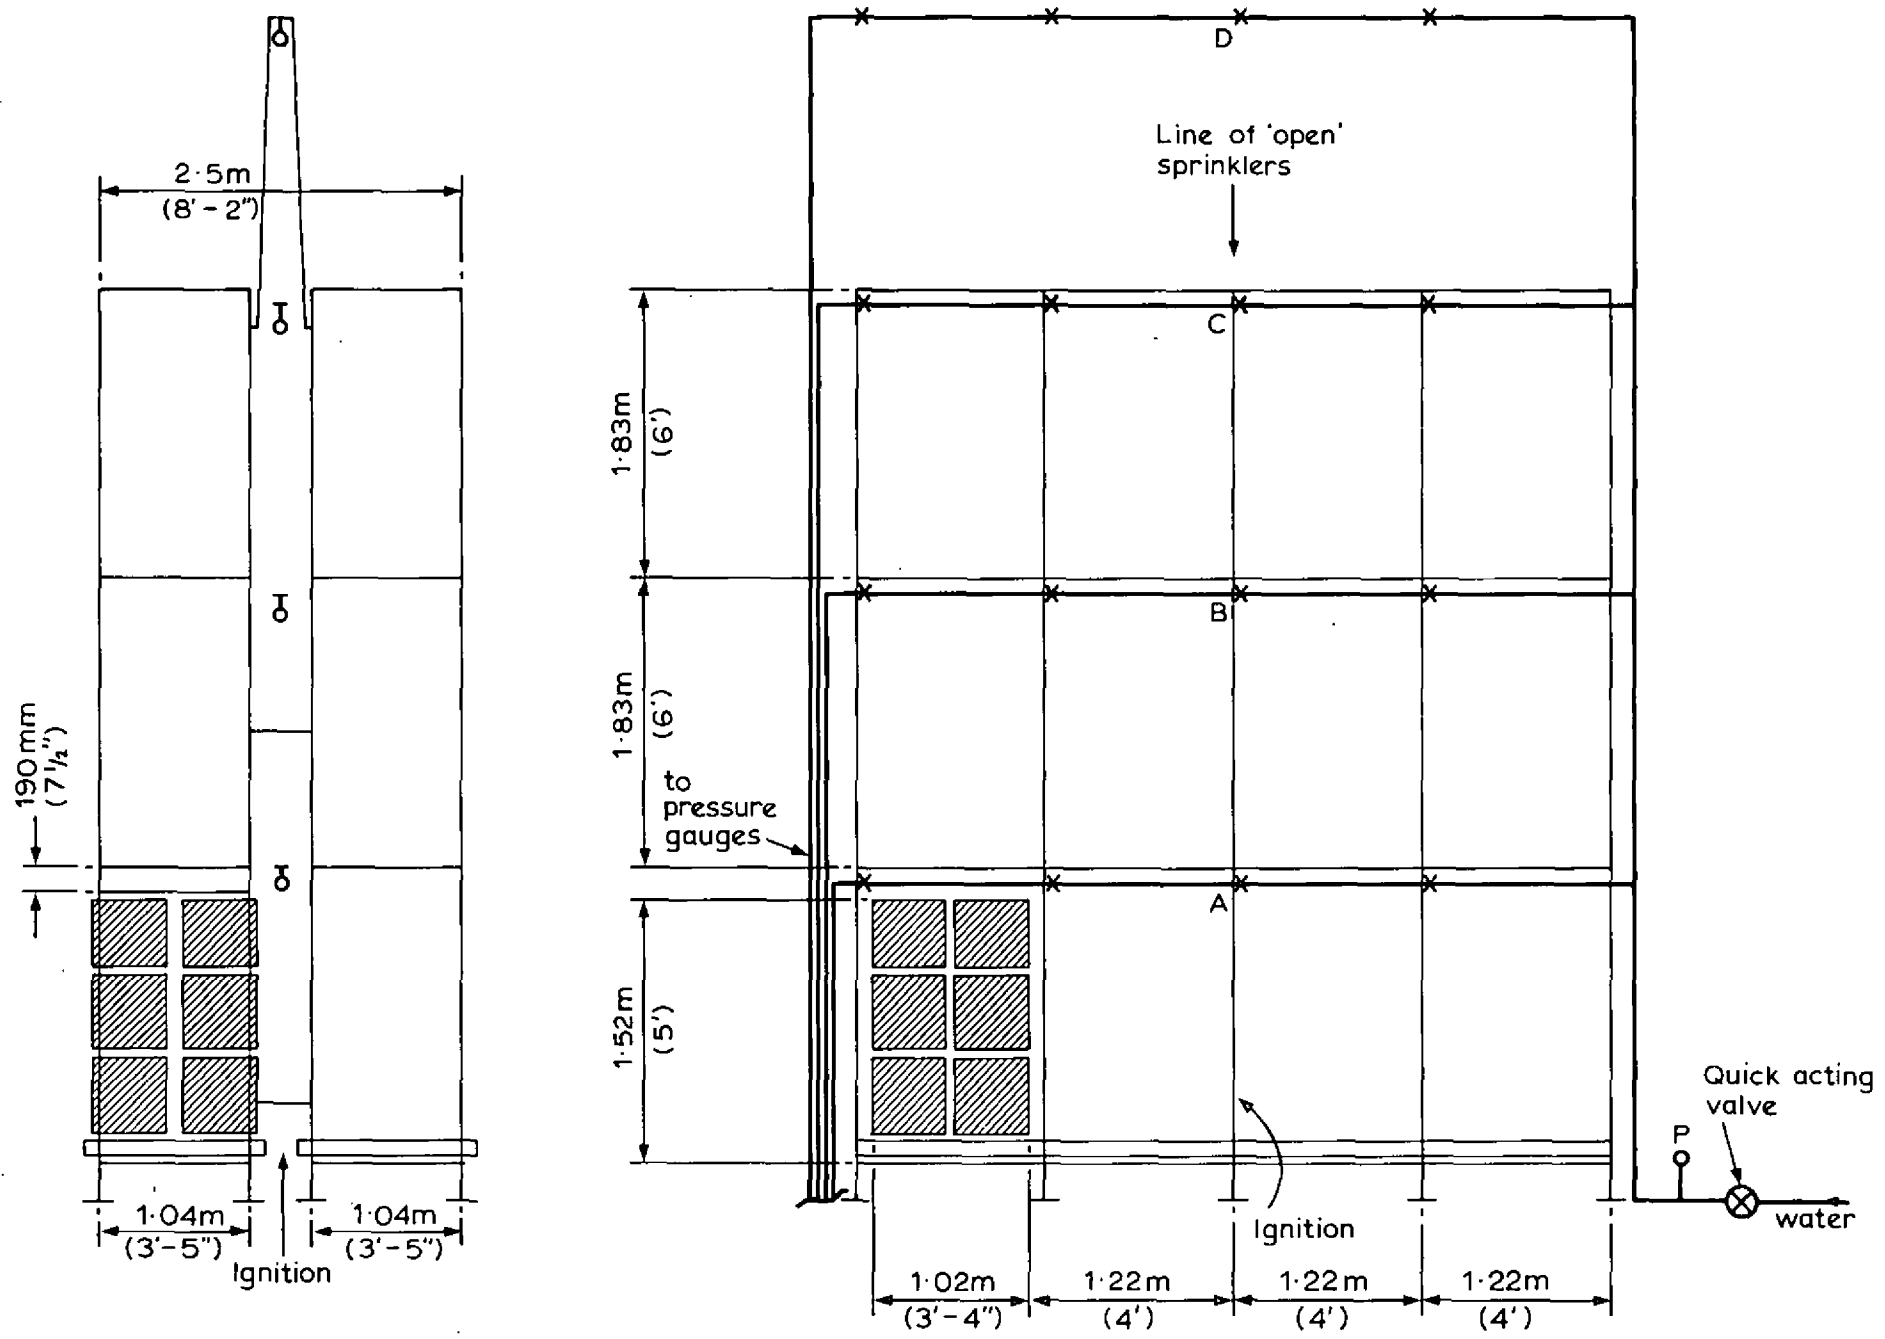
ARRANGEMENT OF RACKING AND SPRINKLERS
